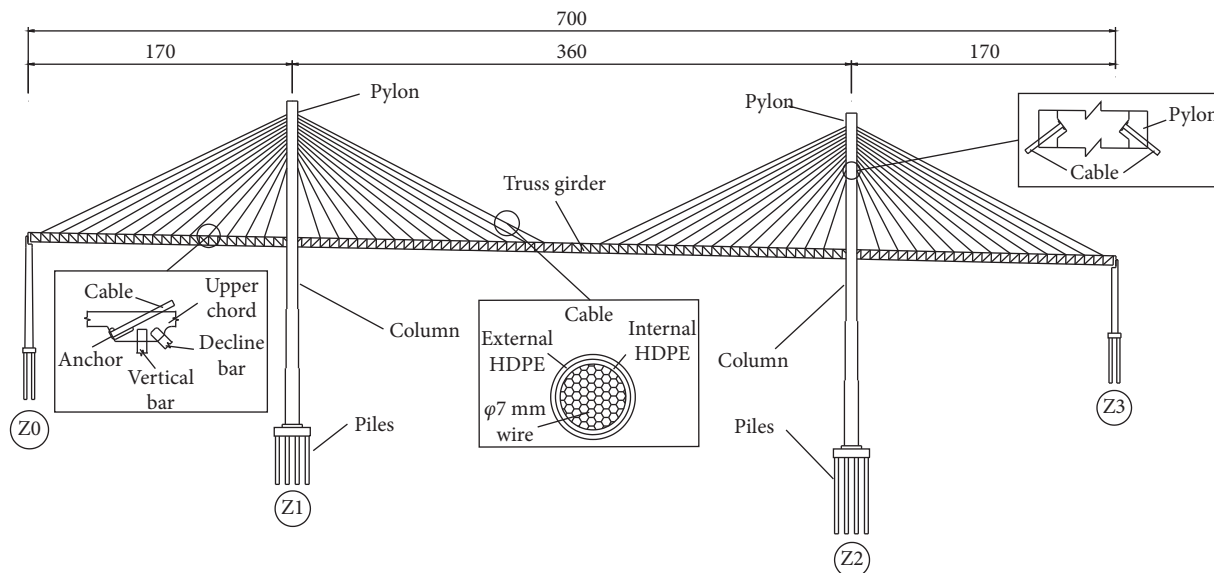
Double-pylon cable-stayed bridge with steel truss girders (Units: m).
